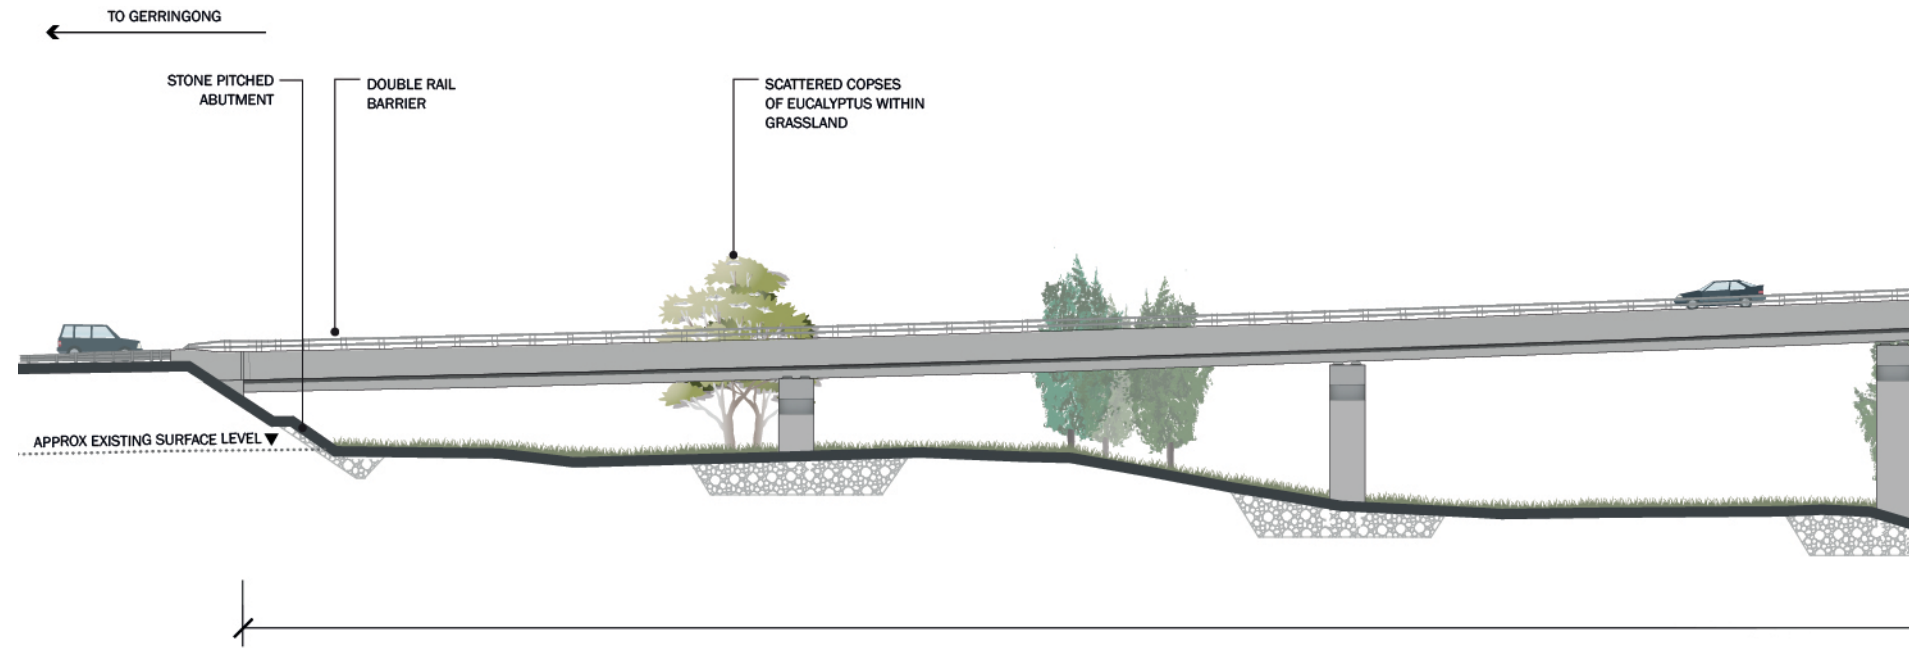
Elevation – Bridge SB04: Broughton Creek Bridge No. 3
